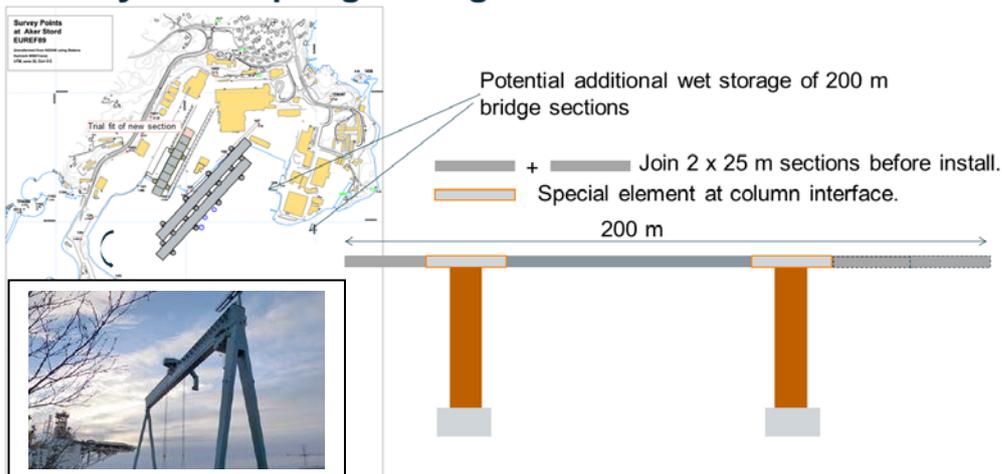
Assembly of ramp sections and high bridge section proposed in dock – example Kværner Stord
